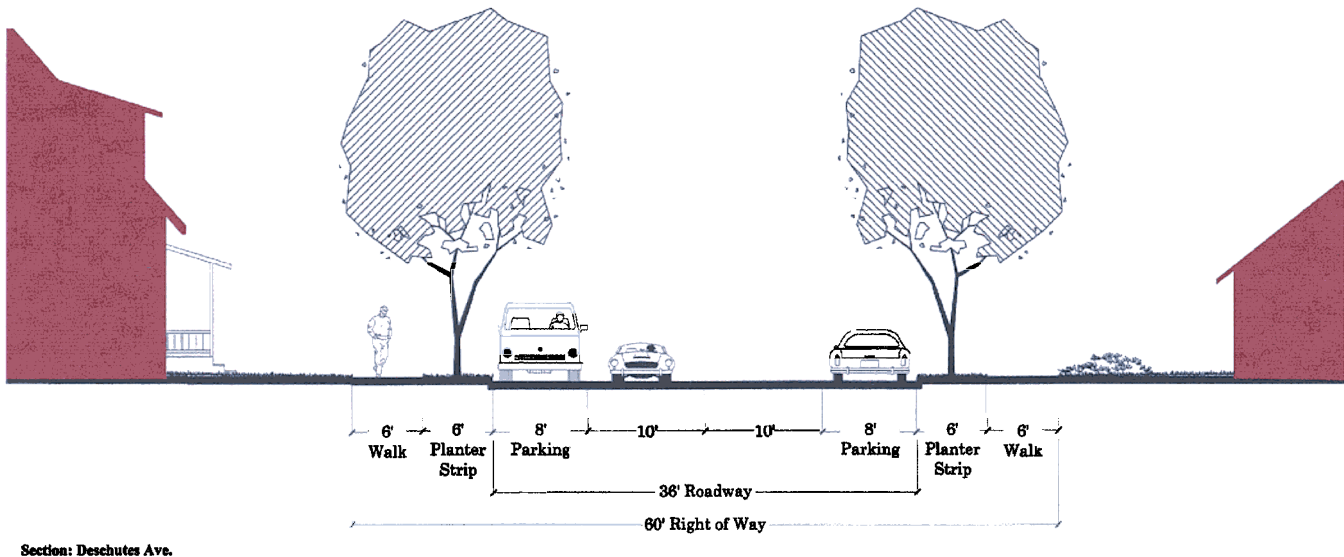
Proposed Deschutes Avenue Improvements West of 9th Street
